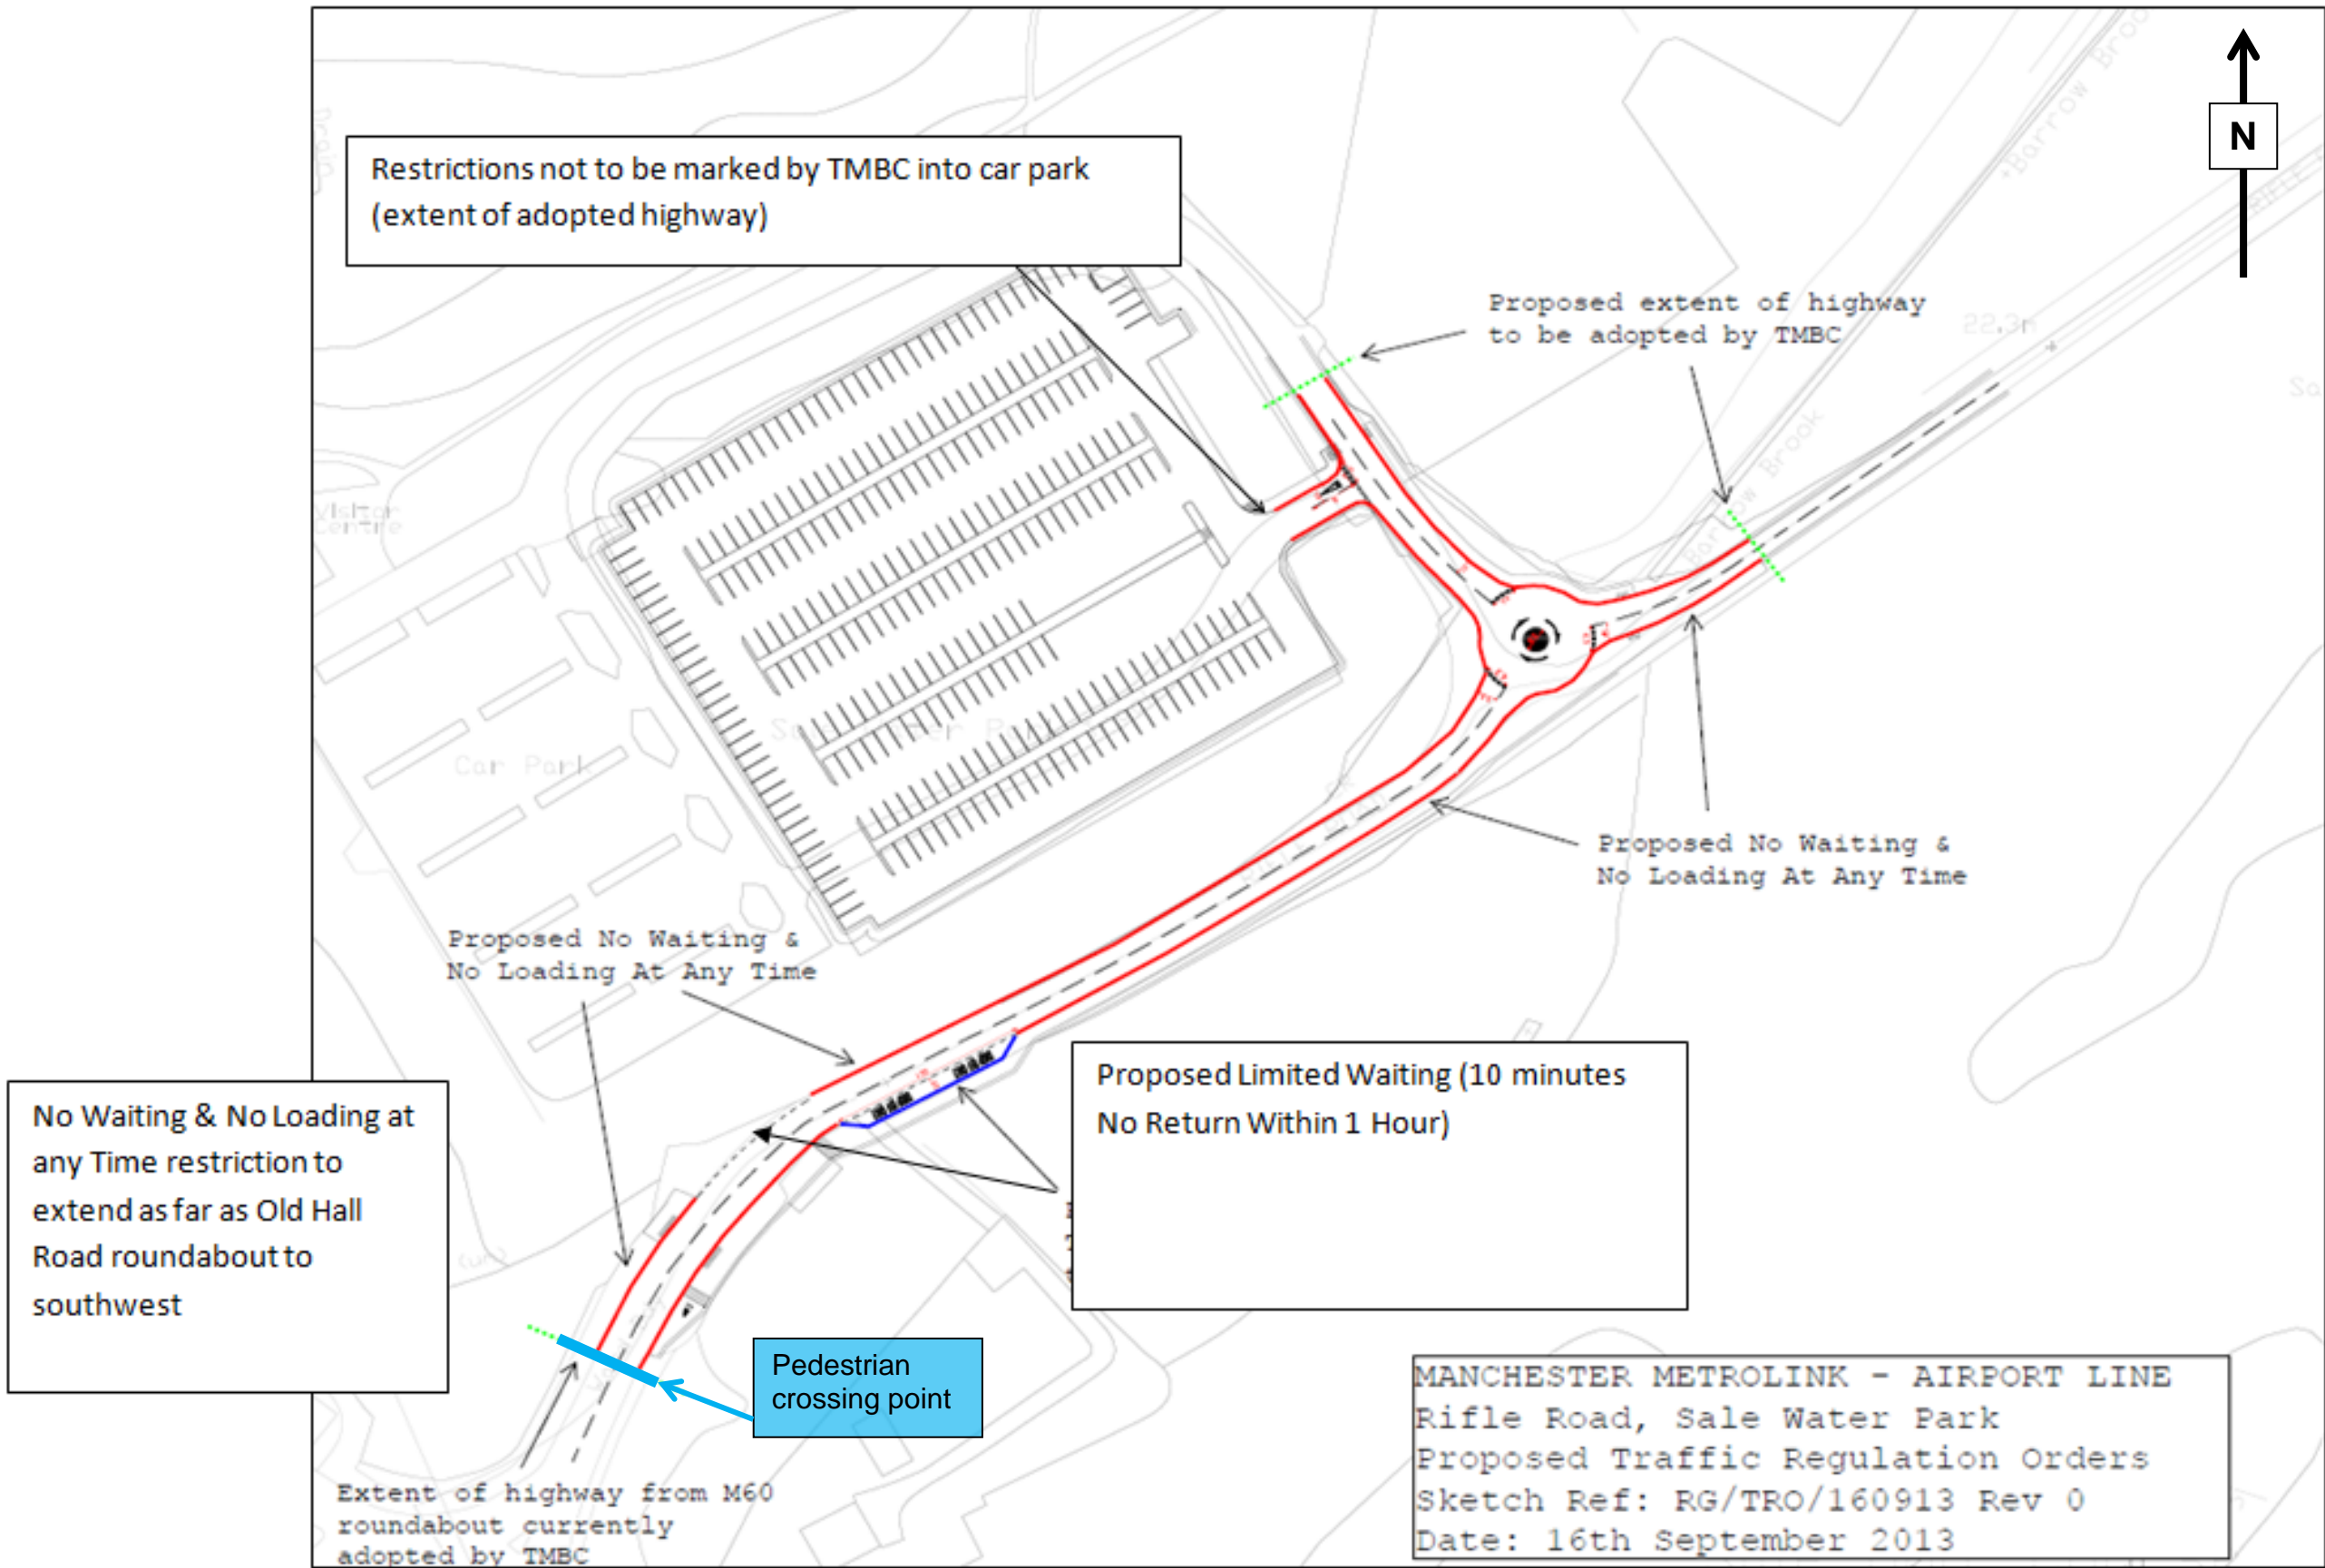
Drawing E8908 – Proposed parking & waiting restrictions
